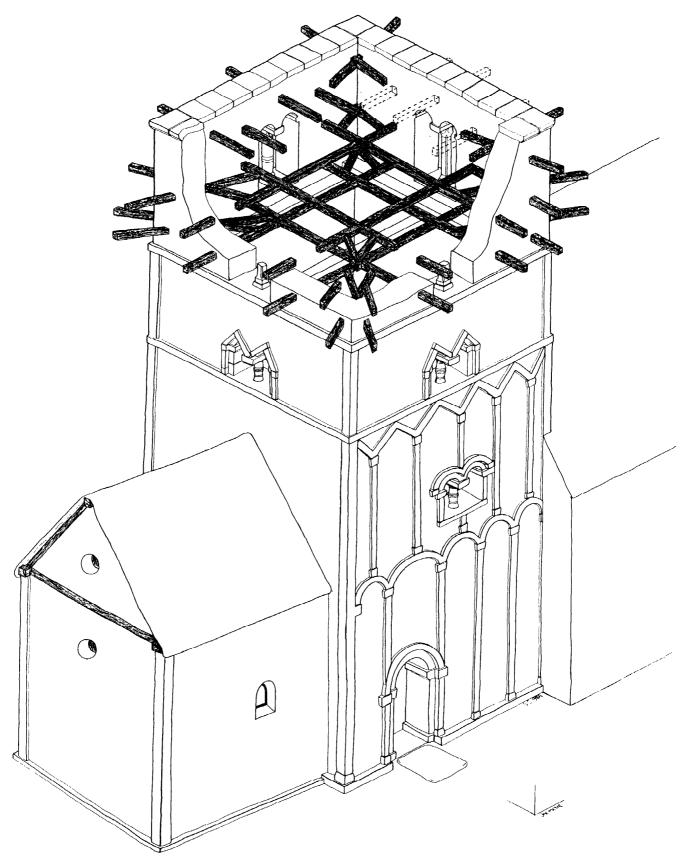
Barton-upon-Humber: cutaway isometric drawing showing reconstruction of the timber framing erected as part of the Saxo-Norman belfry on top of the earlier tower; this framing probably served to anchor a roof spire, and also projected through the walls as cantilevered scaffolding (drawn by Steve Coll)
